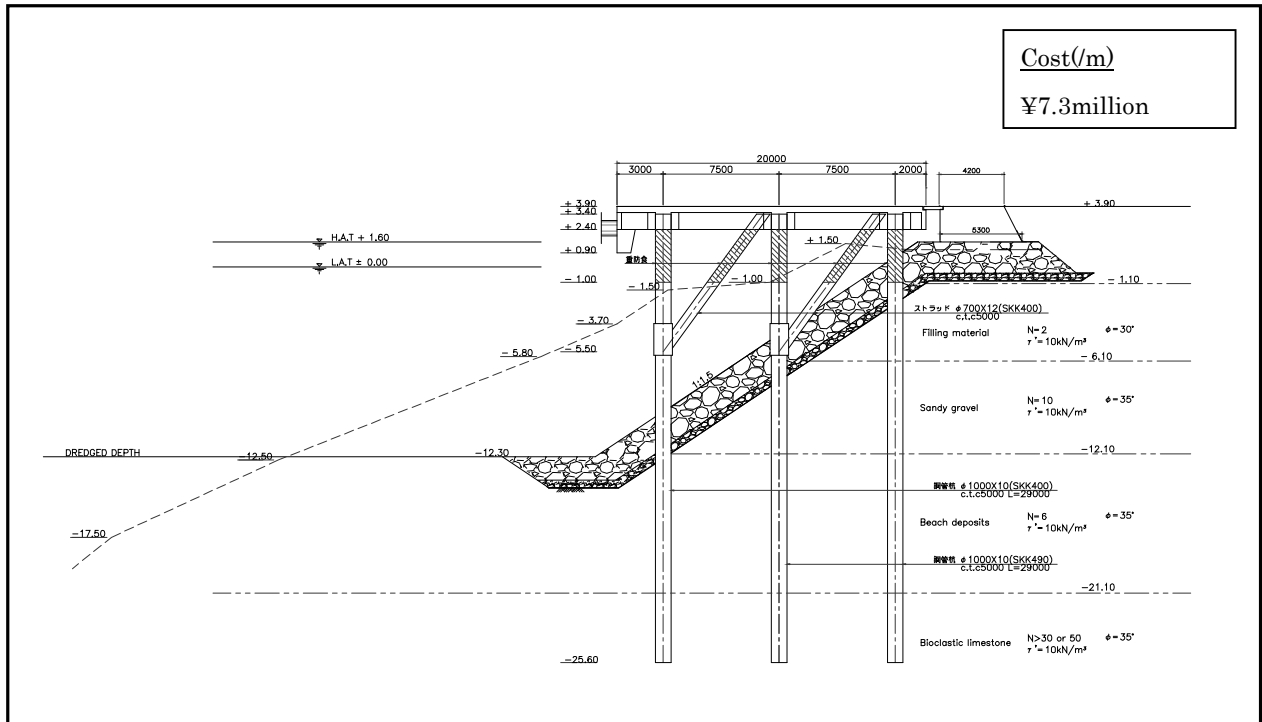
Open Type of wharf on Steel Pipe Piles with Struts (Option 3)
